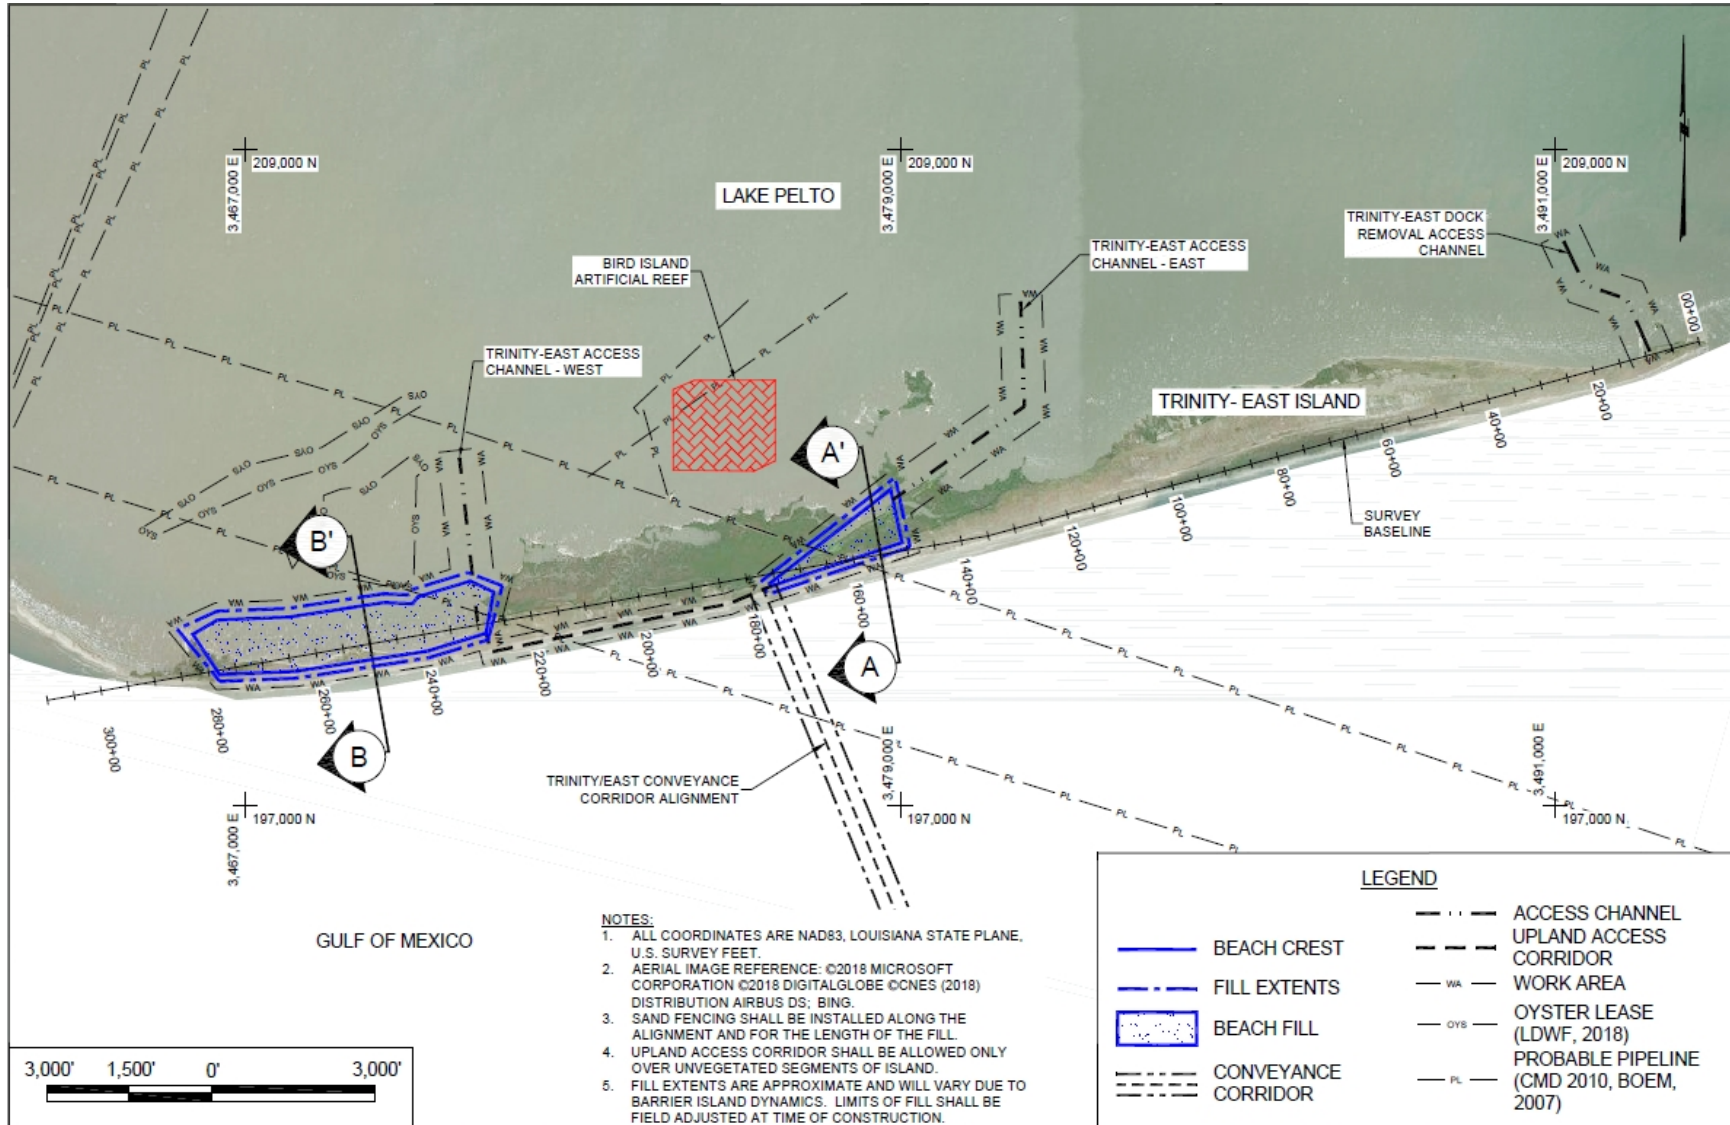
Trinity-East Island Restoration Template – Plan View
